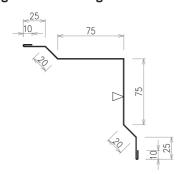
Ob-42.1 flashing "Outer masking corner with valley"
